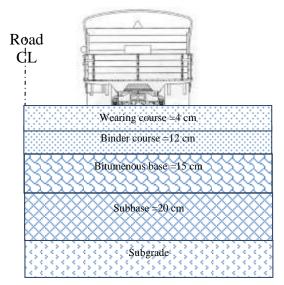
Typical pavement structures in Expressway No.1-Iraq (section R4/B)
